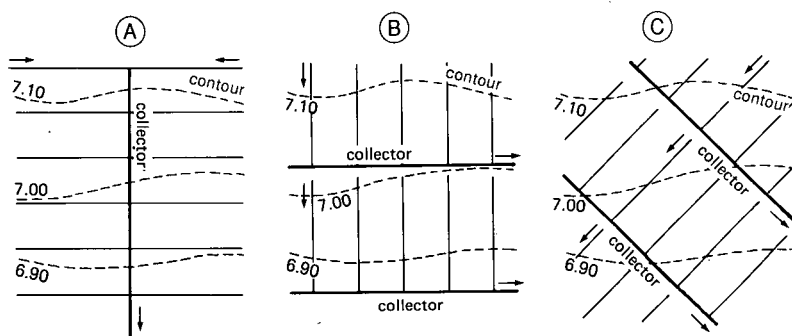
Pipe drainage layout adapted to a uniform slope of the land surface
